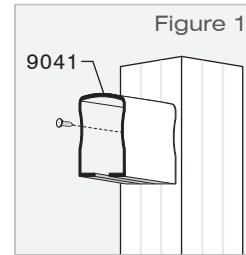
Note: Top Brackets can be mounted to existing walls or posts pending at least 2" of backing is available. Longer screws are required and can be added to the order when the order is placed.
